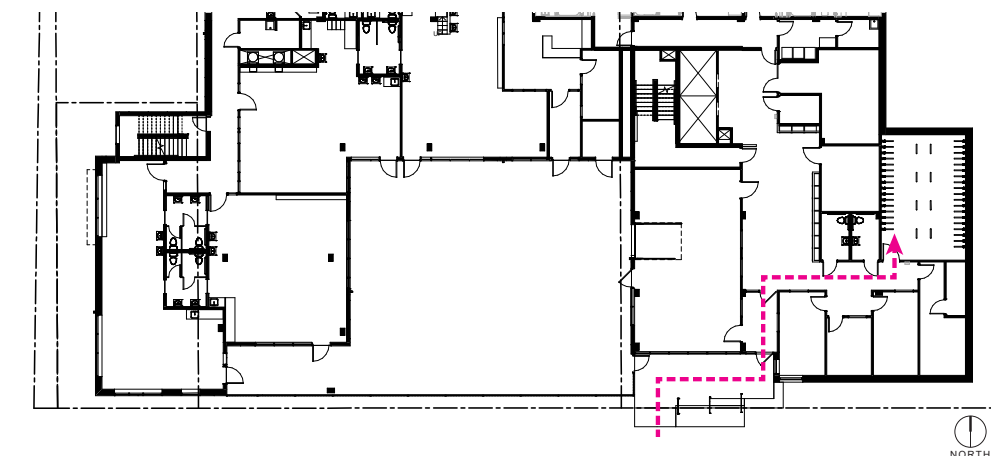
Level 2 Plan showing path of cyclists into residential bike room. short-term bike parking is located adjacent to entries, see Figure 3.5 p28.
